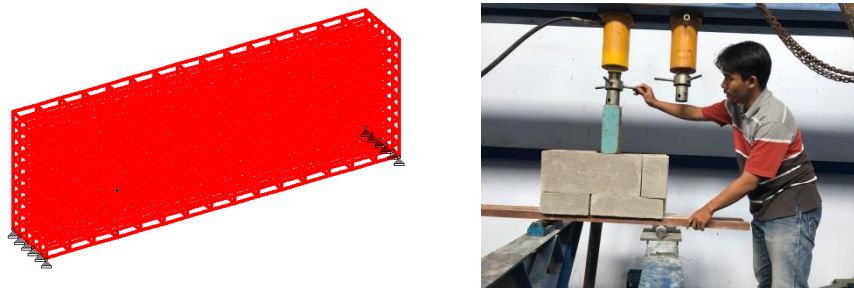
Dead Load on the Lightweight Interlocking Brick Wall in STAAD Pro modelling.
